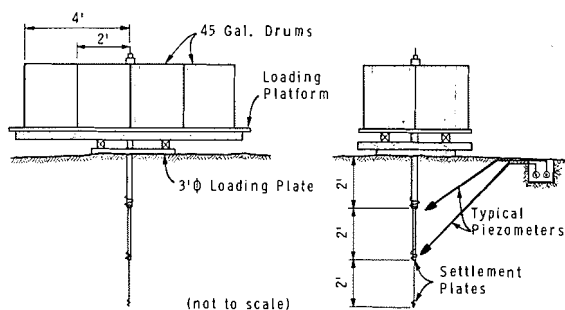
LOADING ARRANGEMENT AND INSTRUMENTATION
